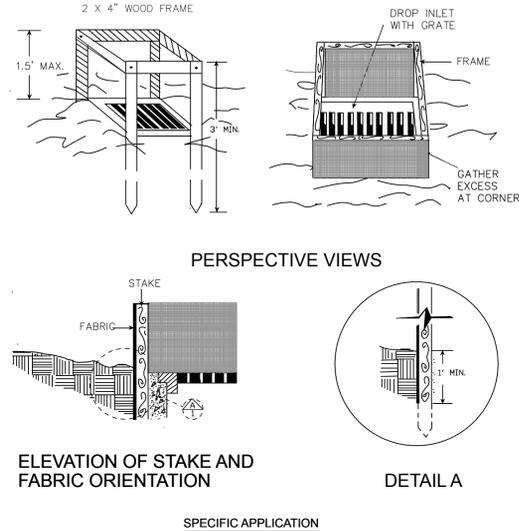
SOURCE: Adapted from Installation of Straw and Fabric Filter Barriers for Sediment Control, VA DSWC
